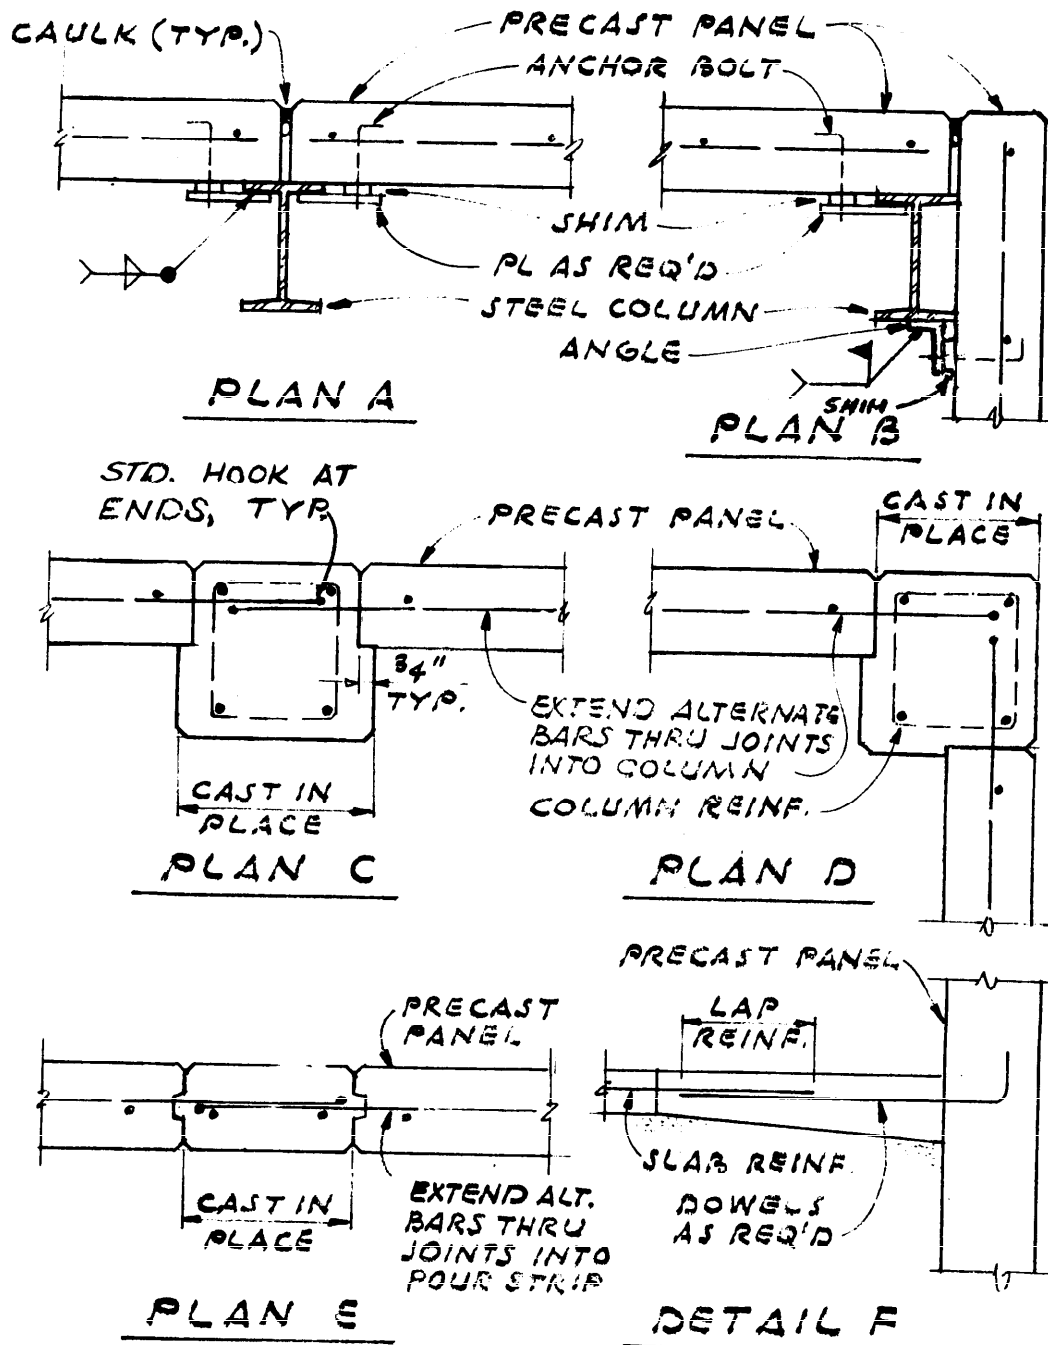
Tilt-up and other precast concrete walls—typical details of attachments.
